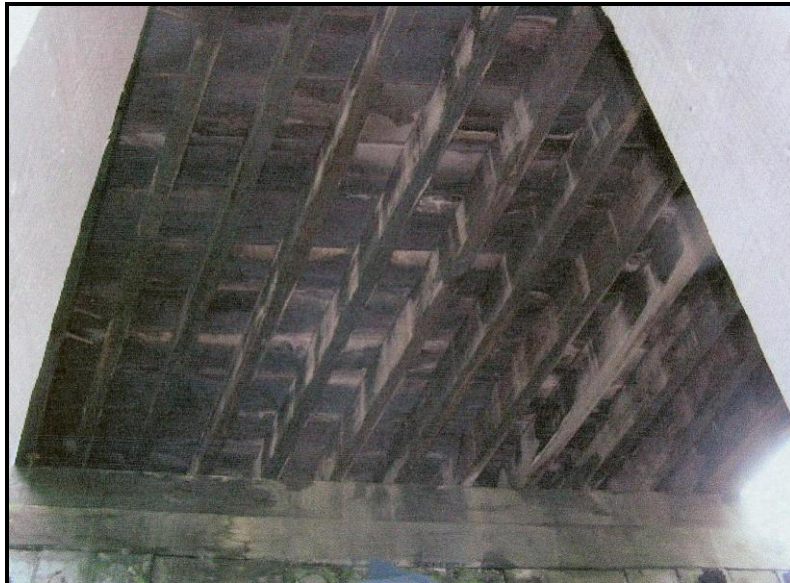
Browns Railroad Overpass Bridge (Bridge 17-014-00-003.29) in Harrison County, constructed in 1901, illustrating a timber stringer bridge (photograph courtesy of West Virginia Division of Highways)
